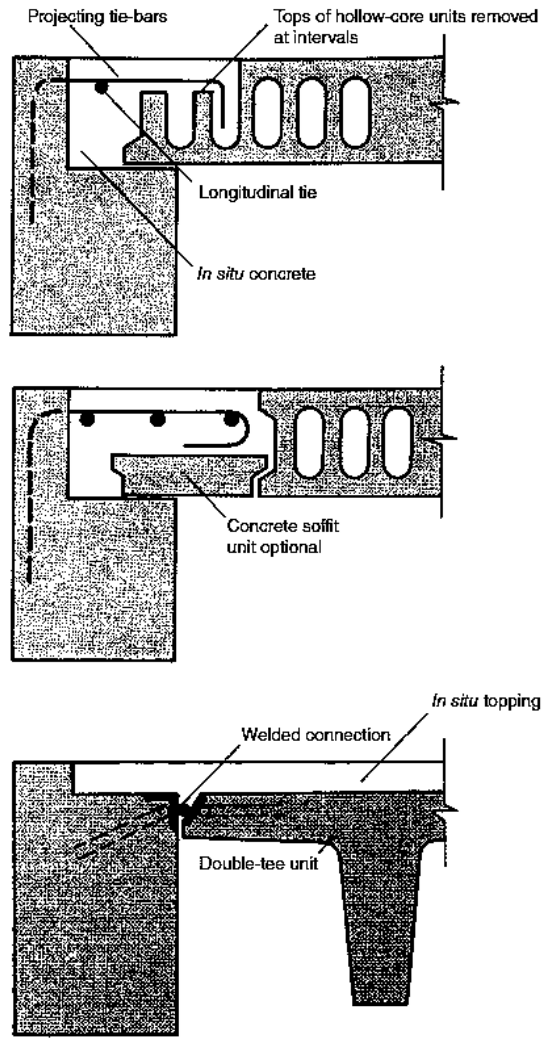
Floor slab to beam connections at longitudinal positions [7.47]. (a) Intermittent tie; (b) continuous *in situ* edge strip; (c) welded tie to double-tie.
